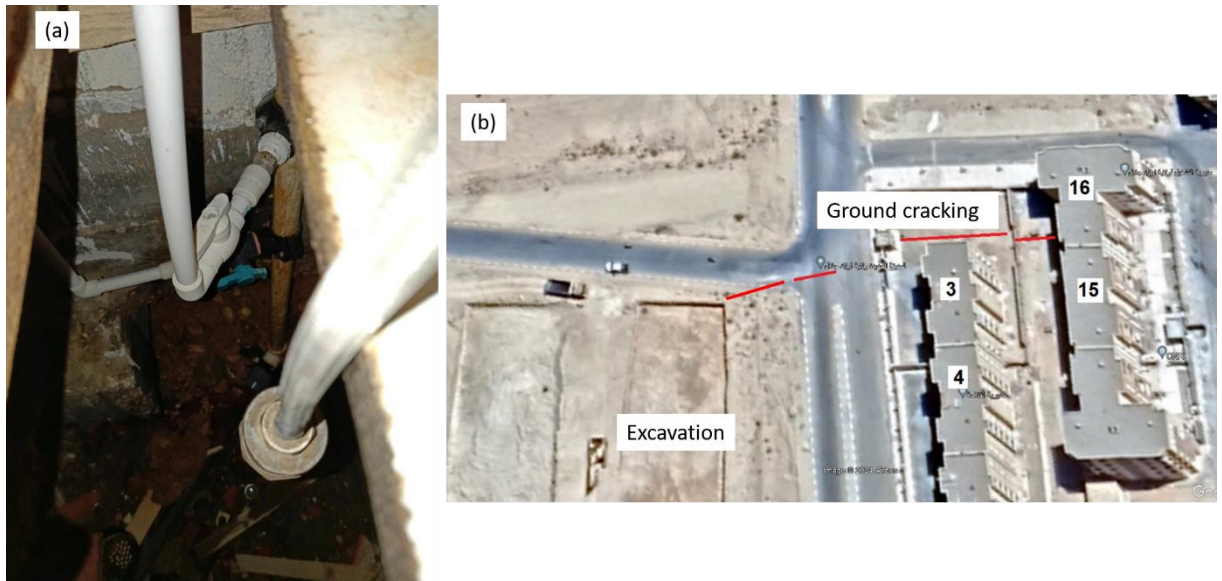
(a) Water pipeline leaks, (b) Ground crack propagation along the red line to the excavation boundary.
